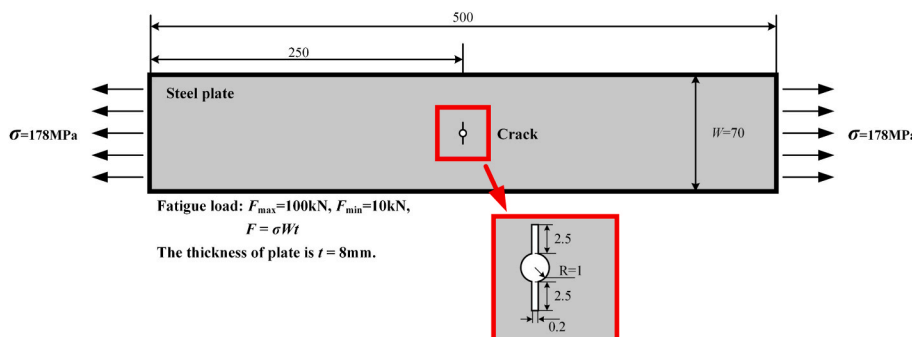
Schematic illustration of cracked steel plate without repair (unit: mm).
